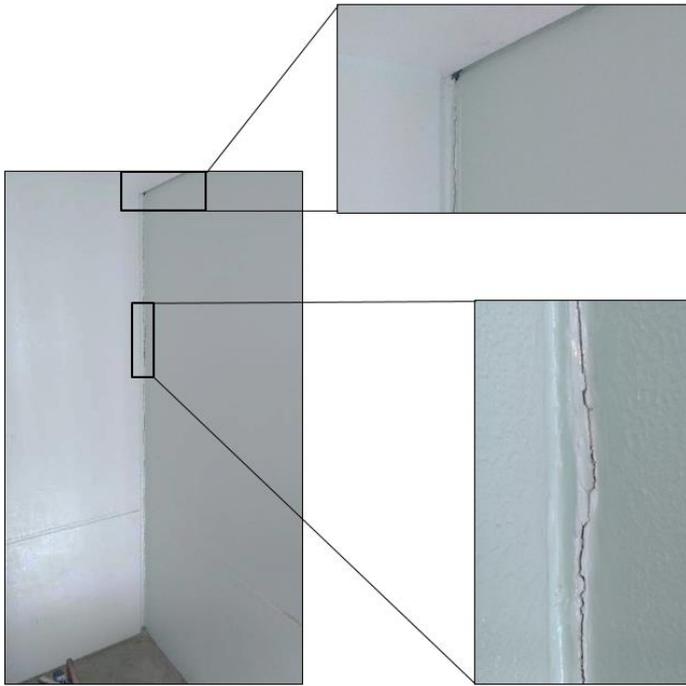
Gaps between adjacent wall panels in the lift and stair cores
